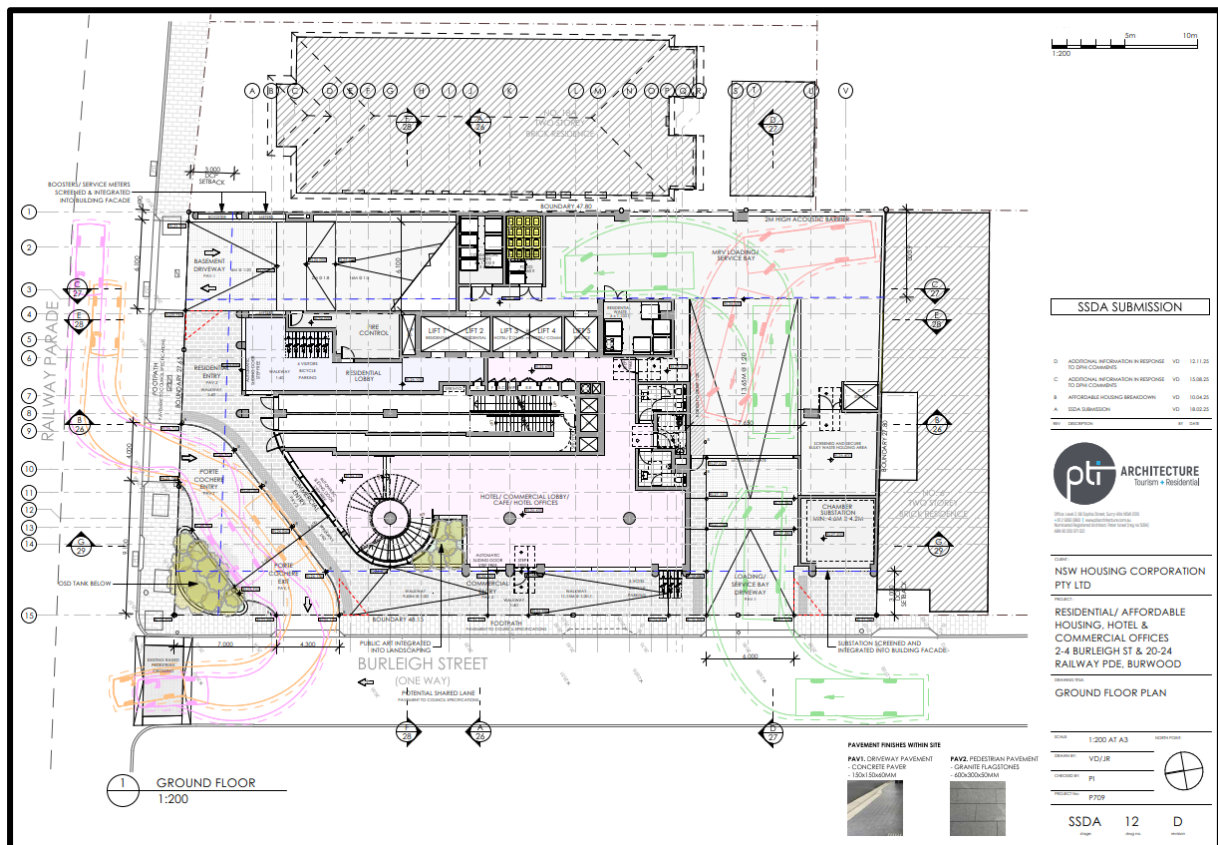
Proposed Driveway servicing Basement Level (Source Architectural Plan Prepared by PTI Architects)
